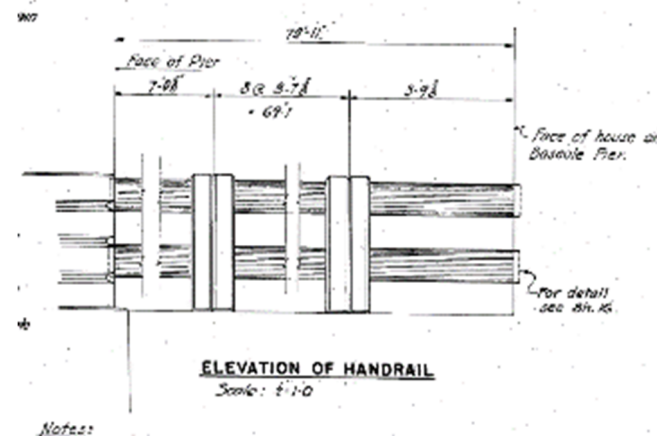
Detail of Parapet at Flanking Span (1939 As-Built Plans)
